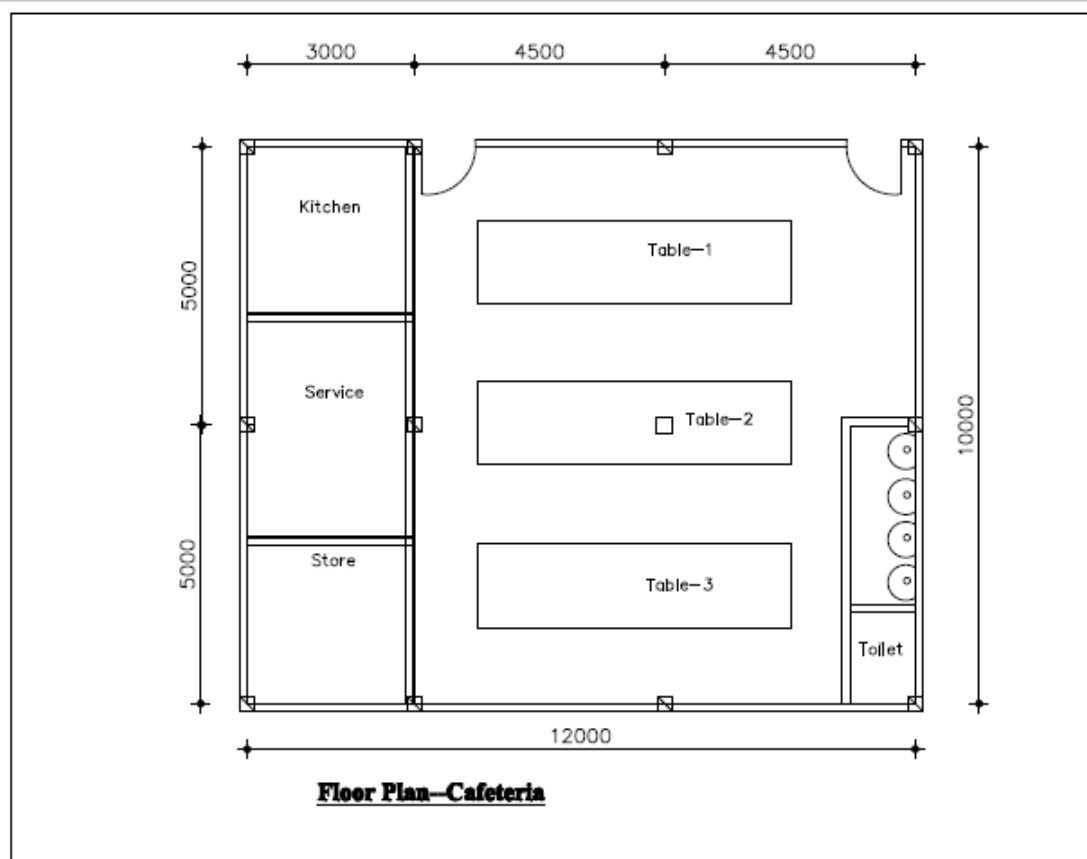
Floor Plan of Proposed Tin Shed Cafeteria
